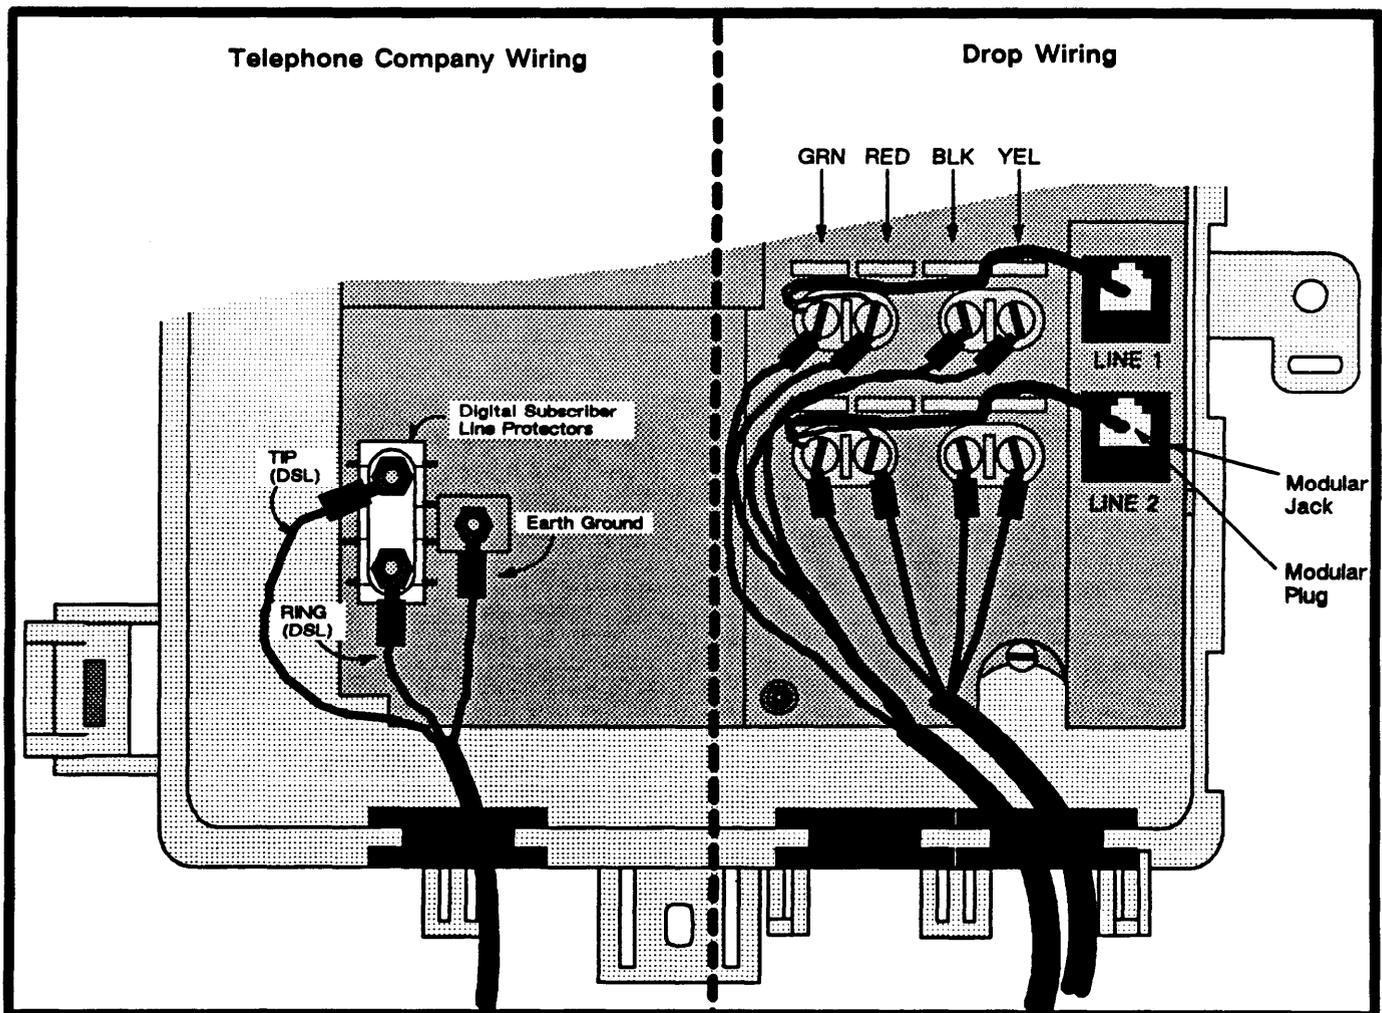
Partial Drawing of Remote Terminal Enclosure Showing Wiring
